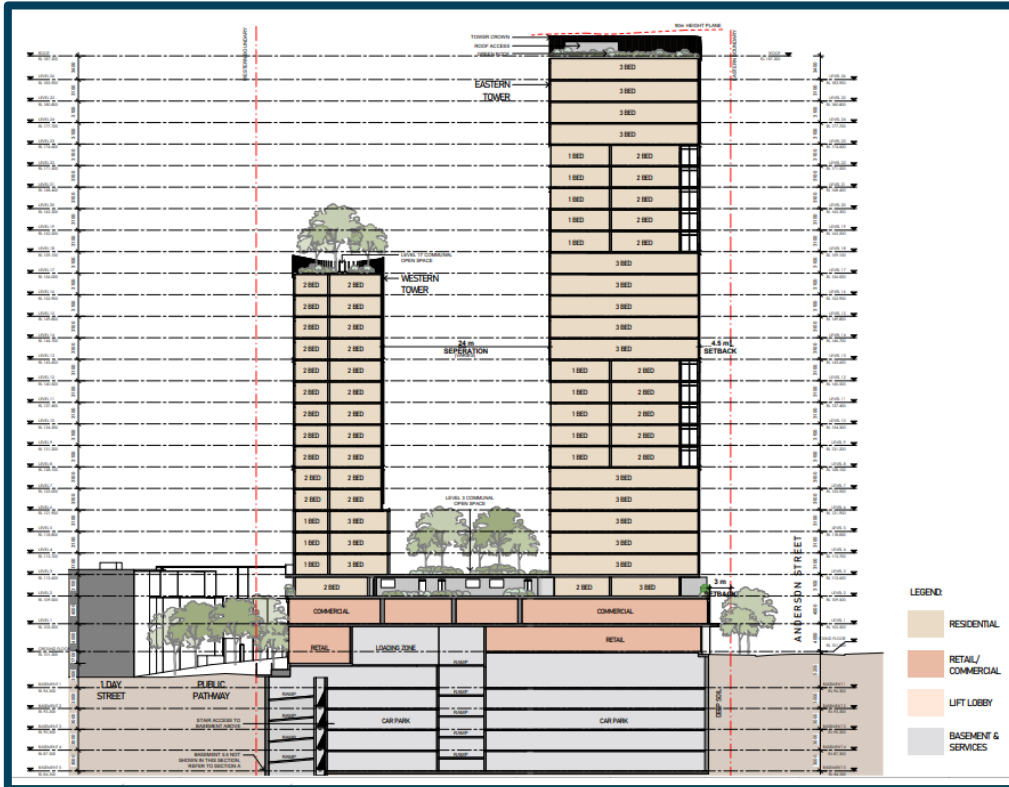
Proposed concept – east-west section (source: Drew Dickson Architects)
